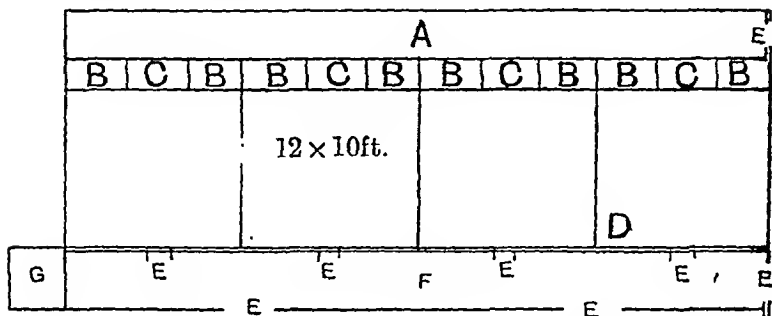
Stalls for cows, two in each stall. A, passage; B, feeding trough; C, water trough; D, calves' room; E, doors; F, verandah to prepare food; G, reservoir; H, drain.
